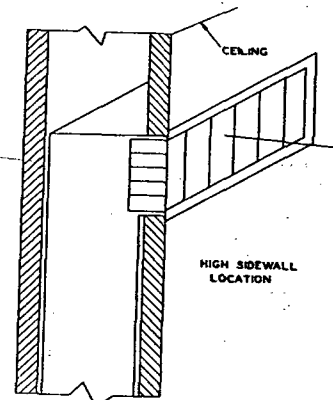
RECOMMENDED TYPE OF HIGH SIDEWALL INSTALLATION ON WARM WALL^b
